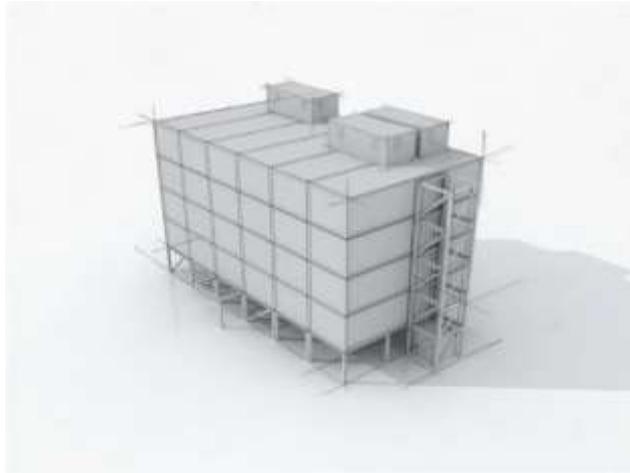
Generic general arrangement of containers with a steel frame ground floor structure and vertical risers
